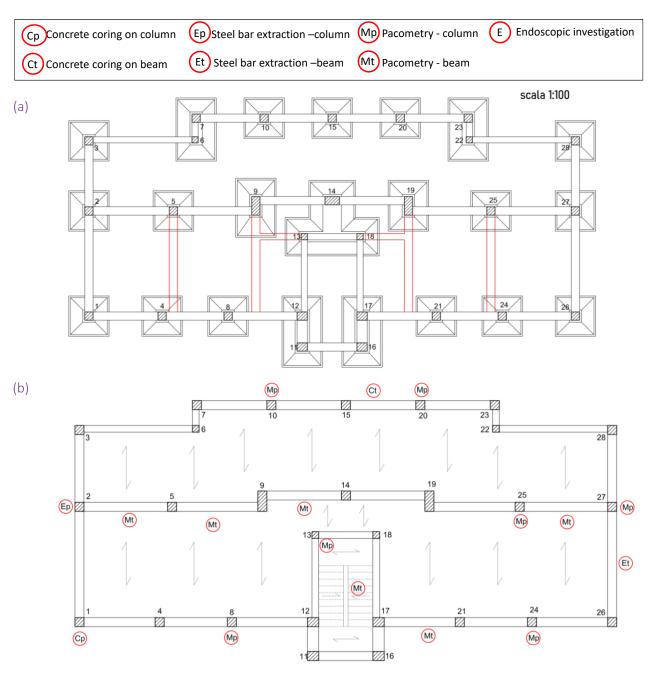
Survey plan – (a) Foundation, (b) Raised ground floor.
